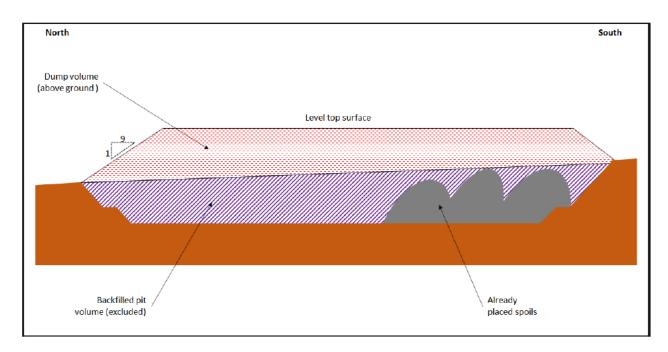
Option 2a schematic section showing discard placement on top of backfilled spoil
